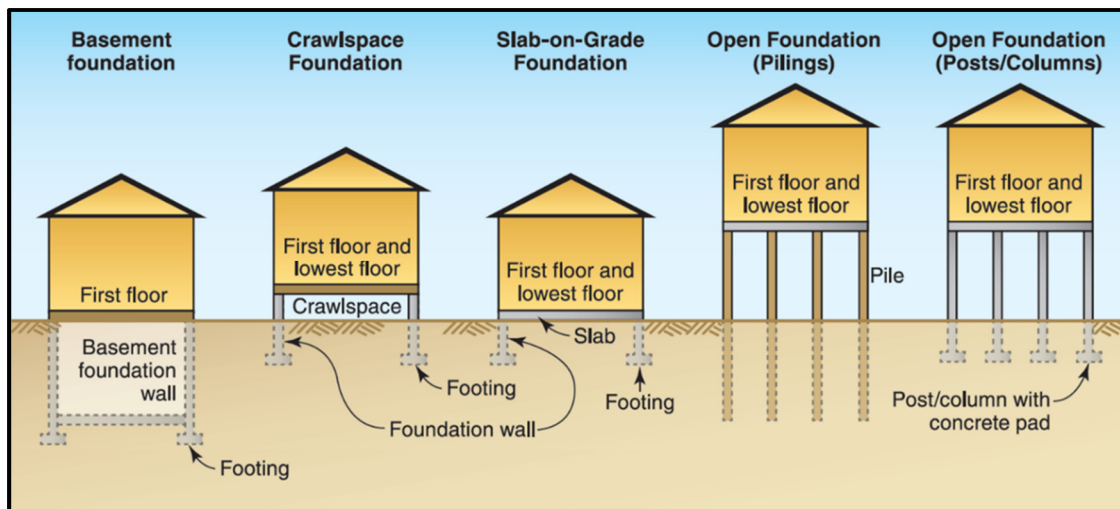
Common Building Foundations (source: FEMA Homeowner's Guide to Retrofitting)
